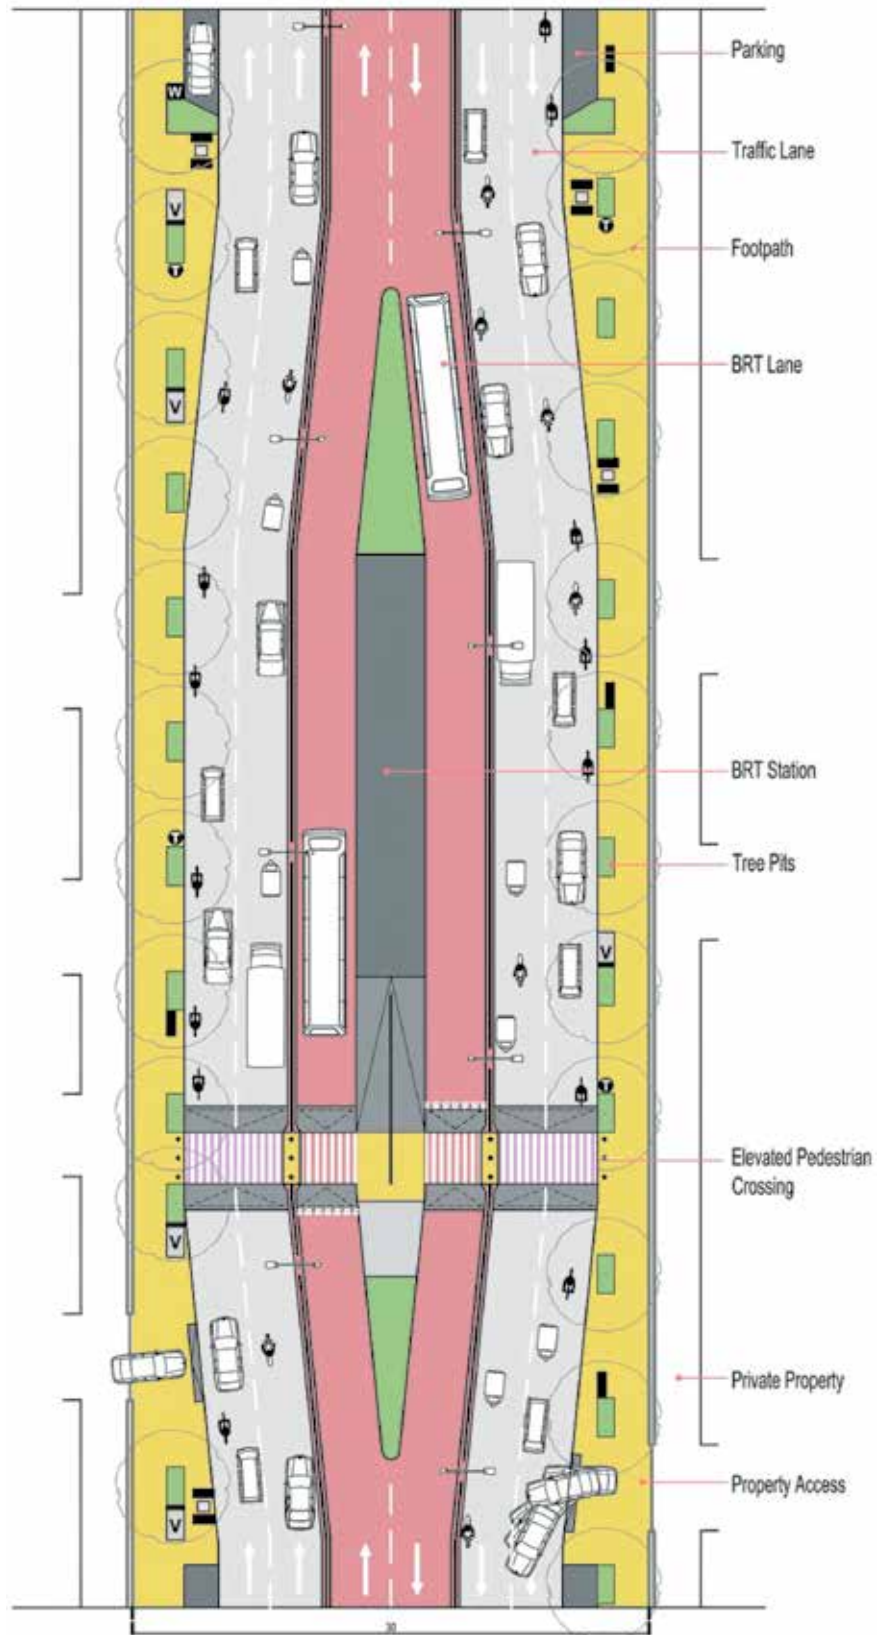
Plan view of a typical BRT configuration without passing lanes (30 m street)
